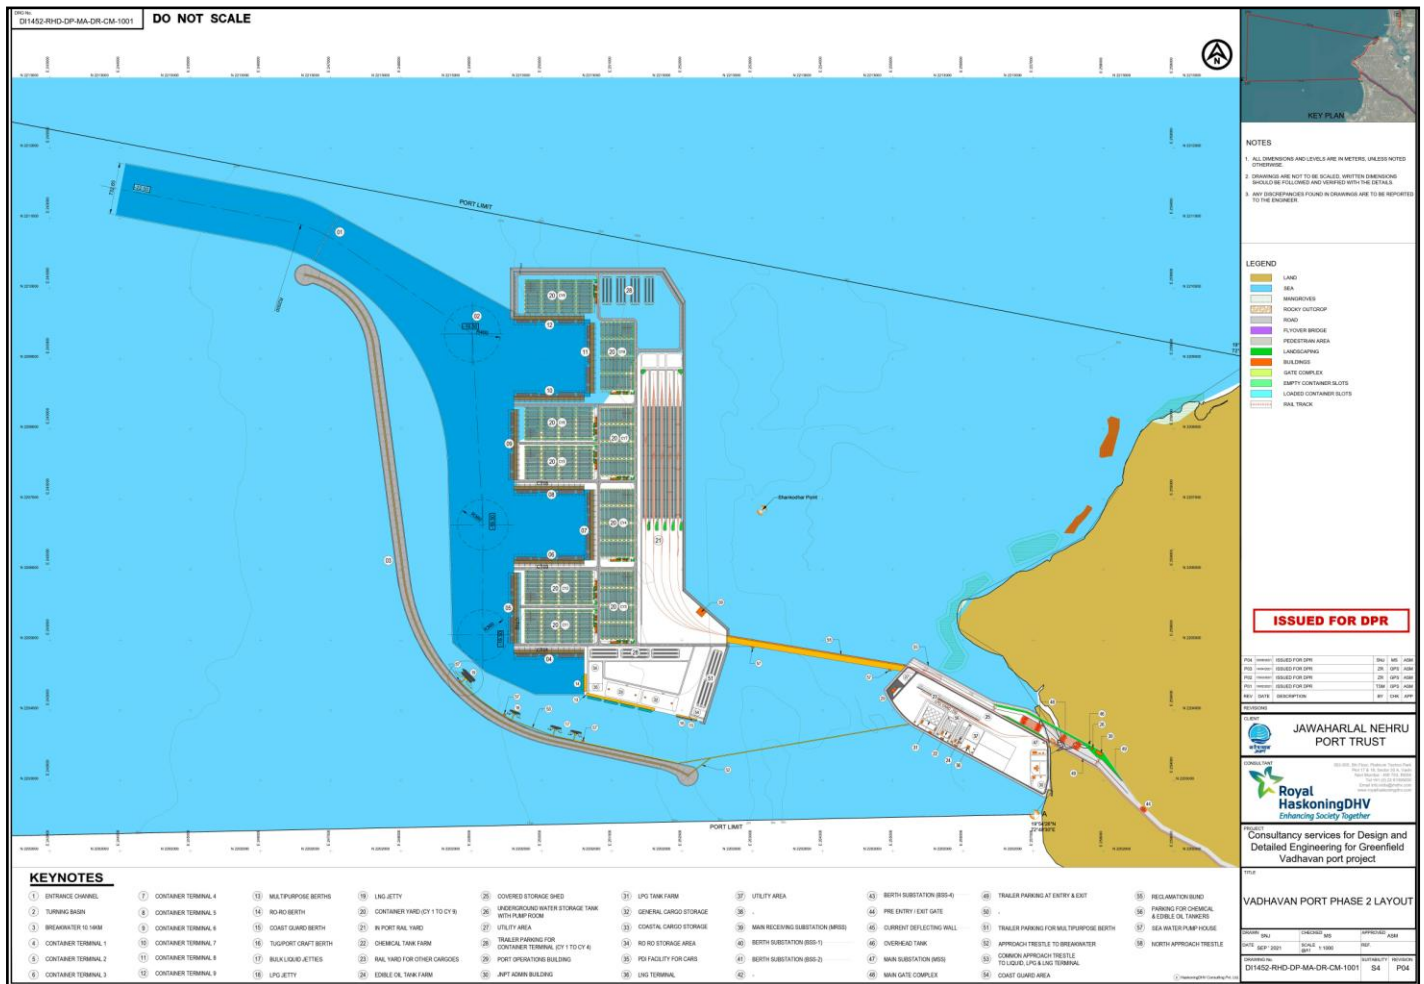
Layout plan of breakwater for the development of Port at Vadhavan, Maharashtra
